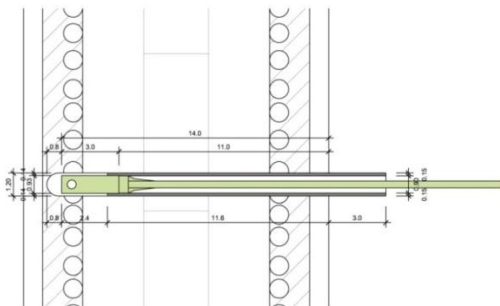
Detail of the installation of the wall sensor, vertical section, load-bearing wall
